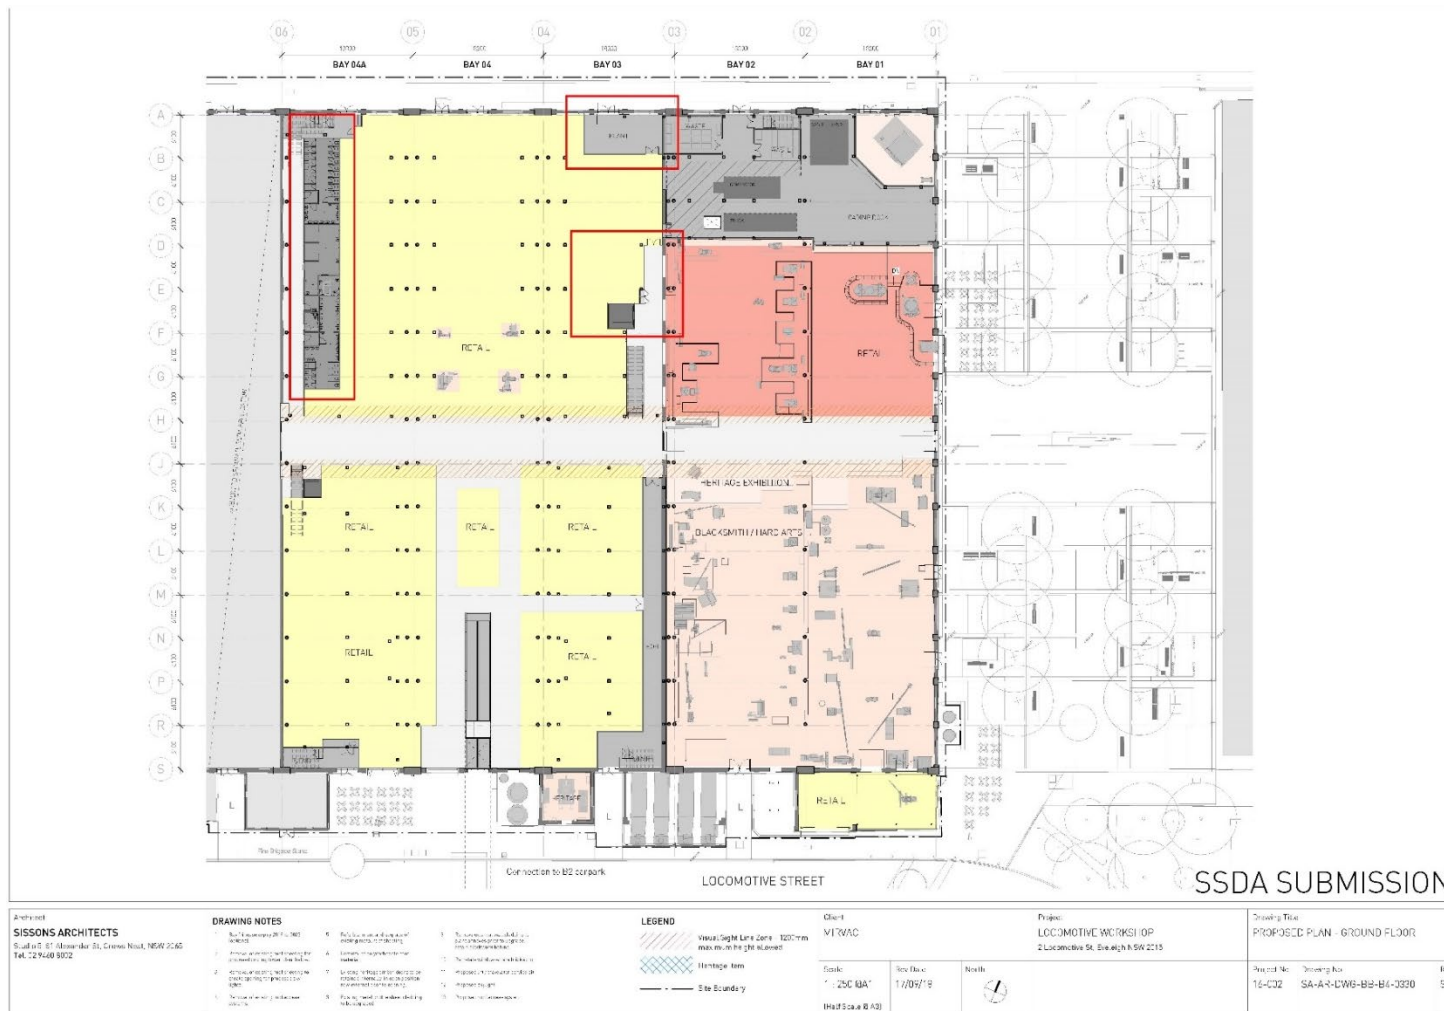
Approved Ground Floor Retail Plan, SSD 8517
